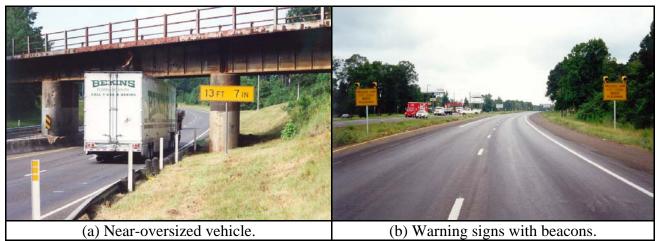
Warning System and Railroad Bridge at Site 100-23.
